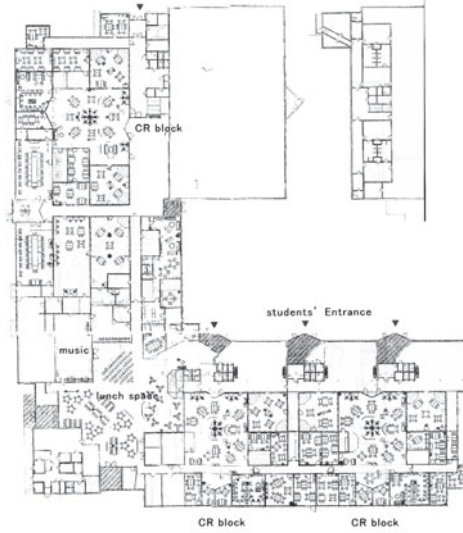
Floor plan Futurum Haboskolan, Balsta, Stockholm, Sweden, 1999 (Jack Pattison, Architect).
